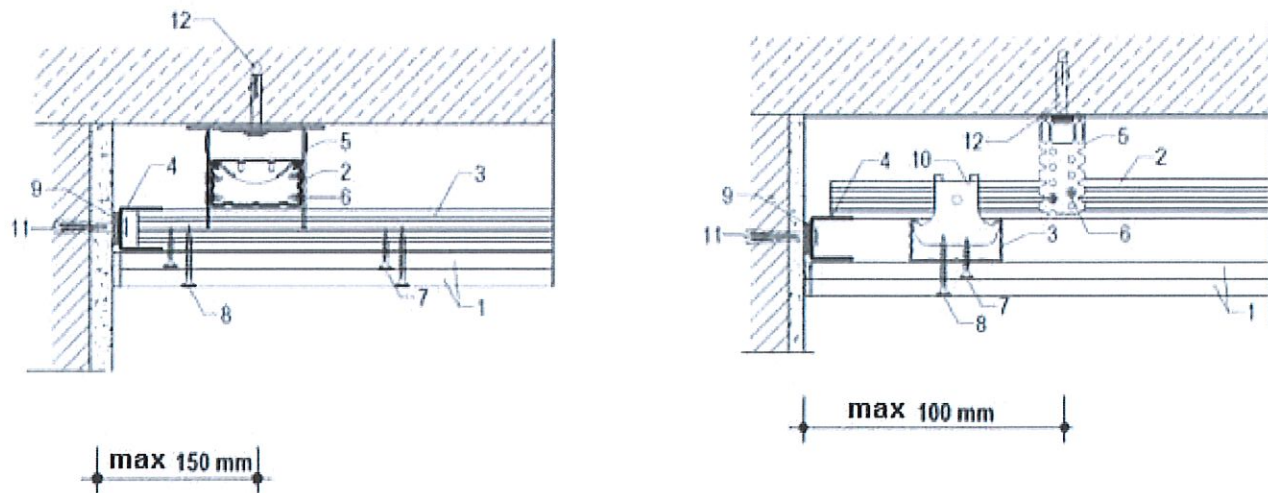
Longitudinal section of the suspended ceiling – two level cross construction
